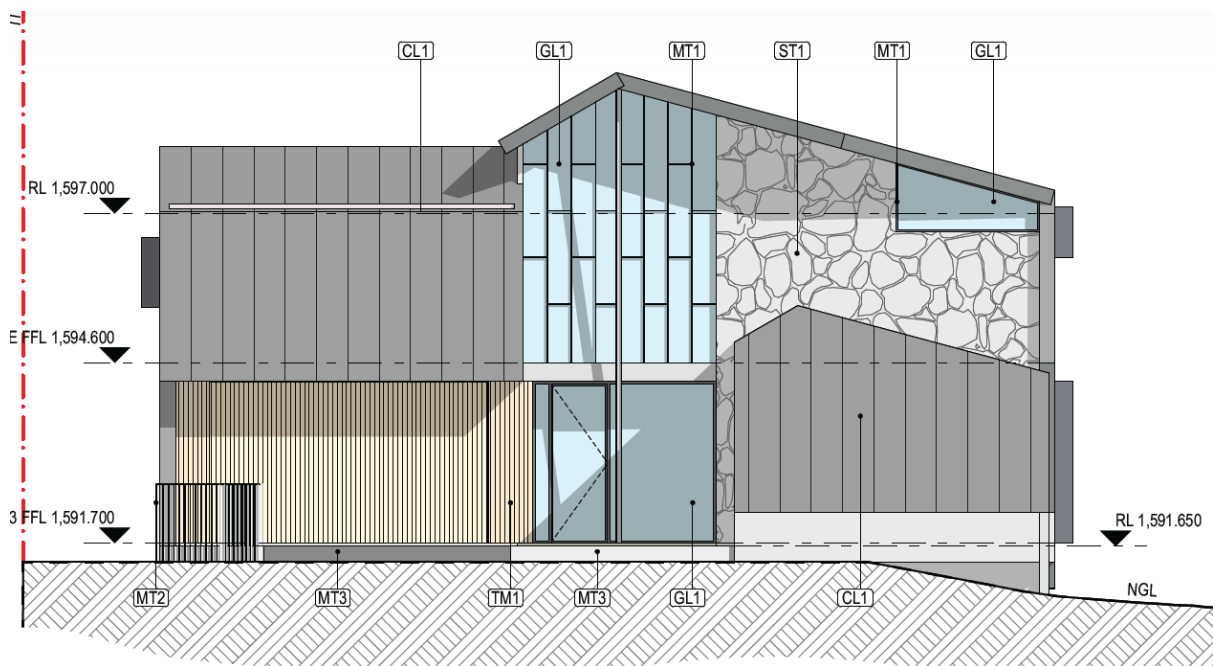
Proposed Eastern Elevation (to The Avenue)
